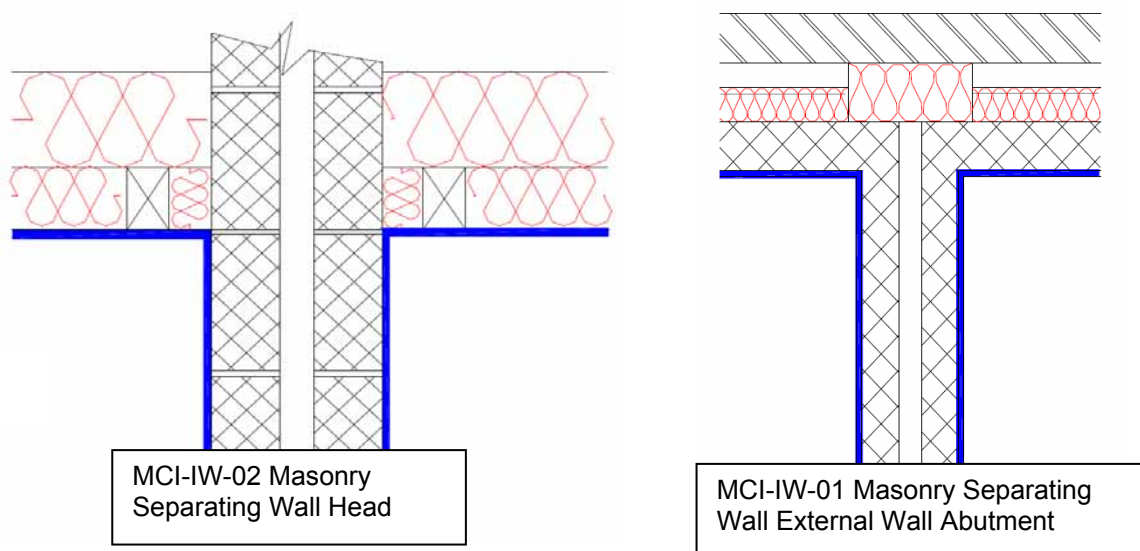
Accredited Detail Drawings – Masonry Separating Wall (DCLG 2007)
